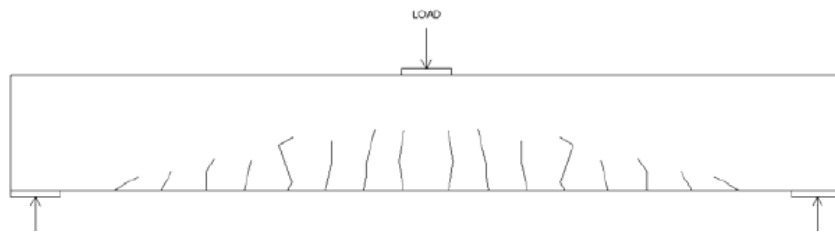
Cracking along Tensile Reinforcement for Thin Beam
